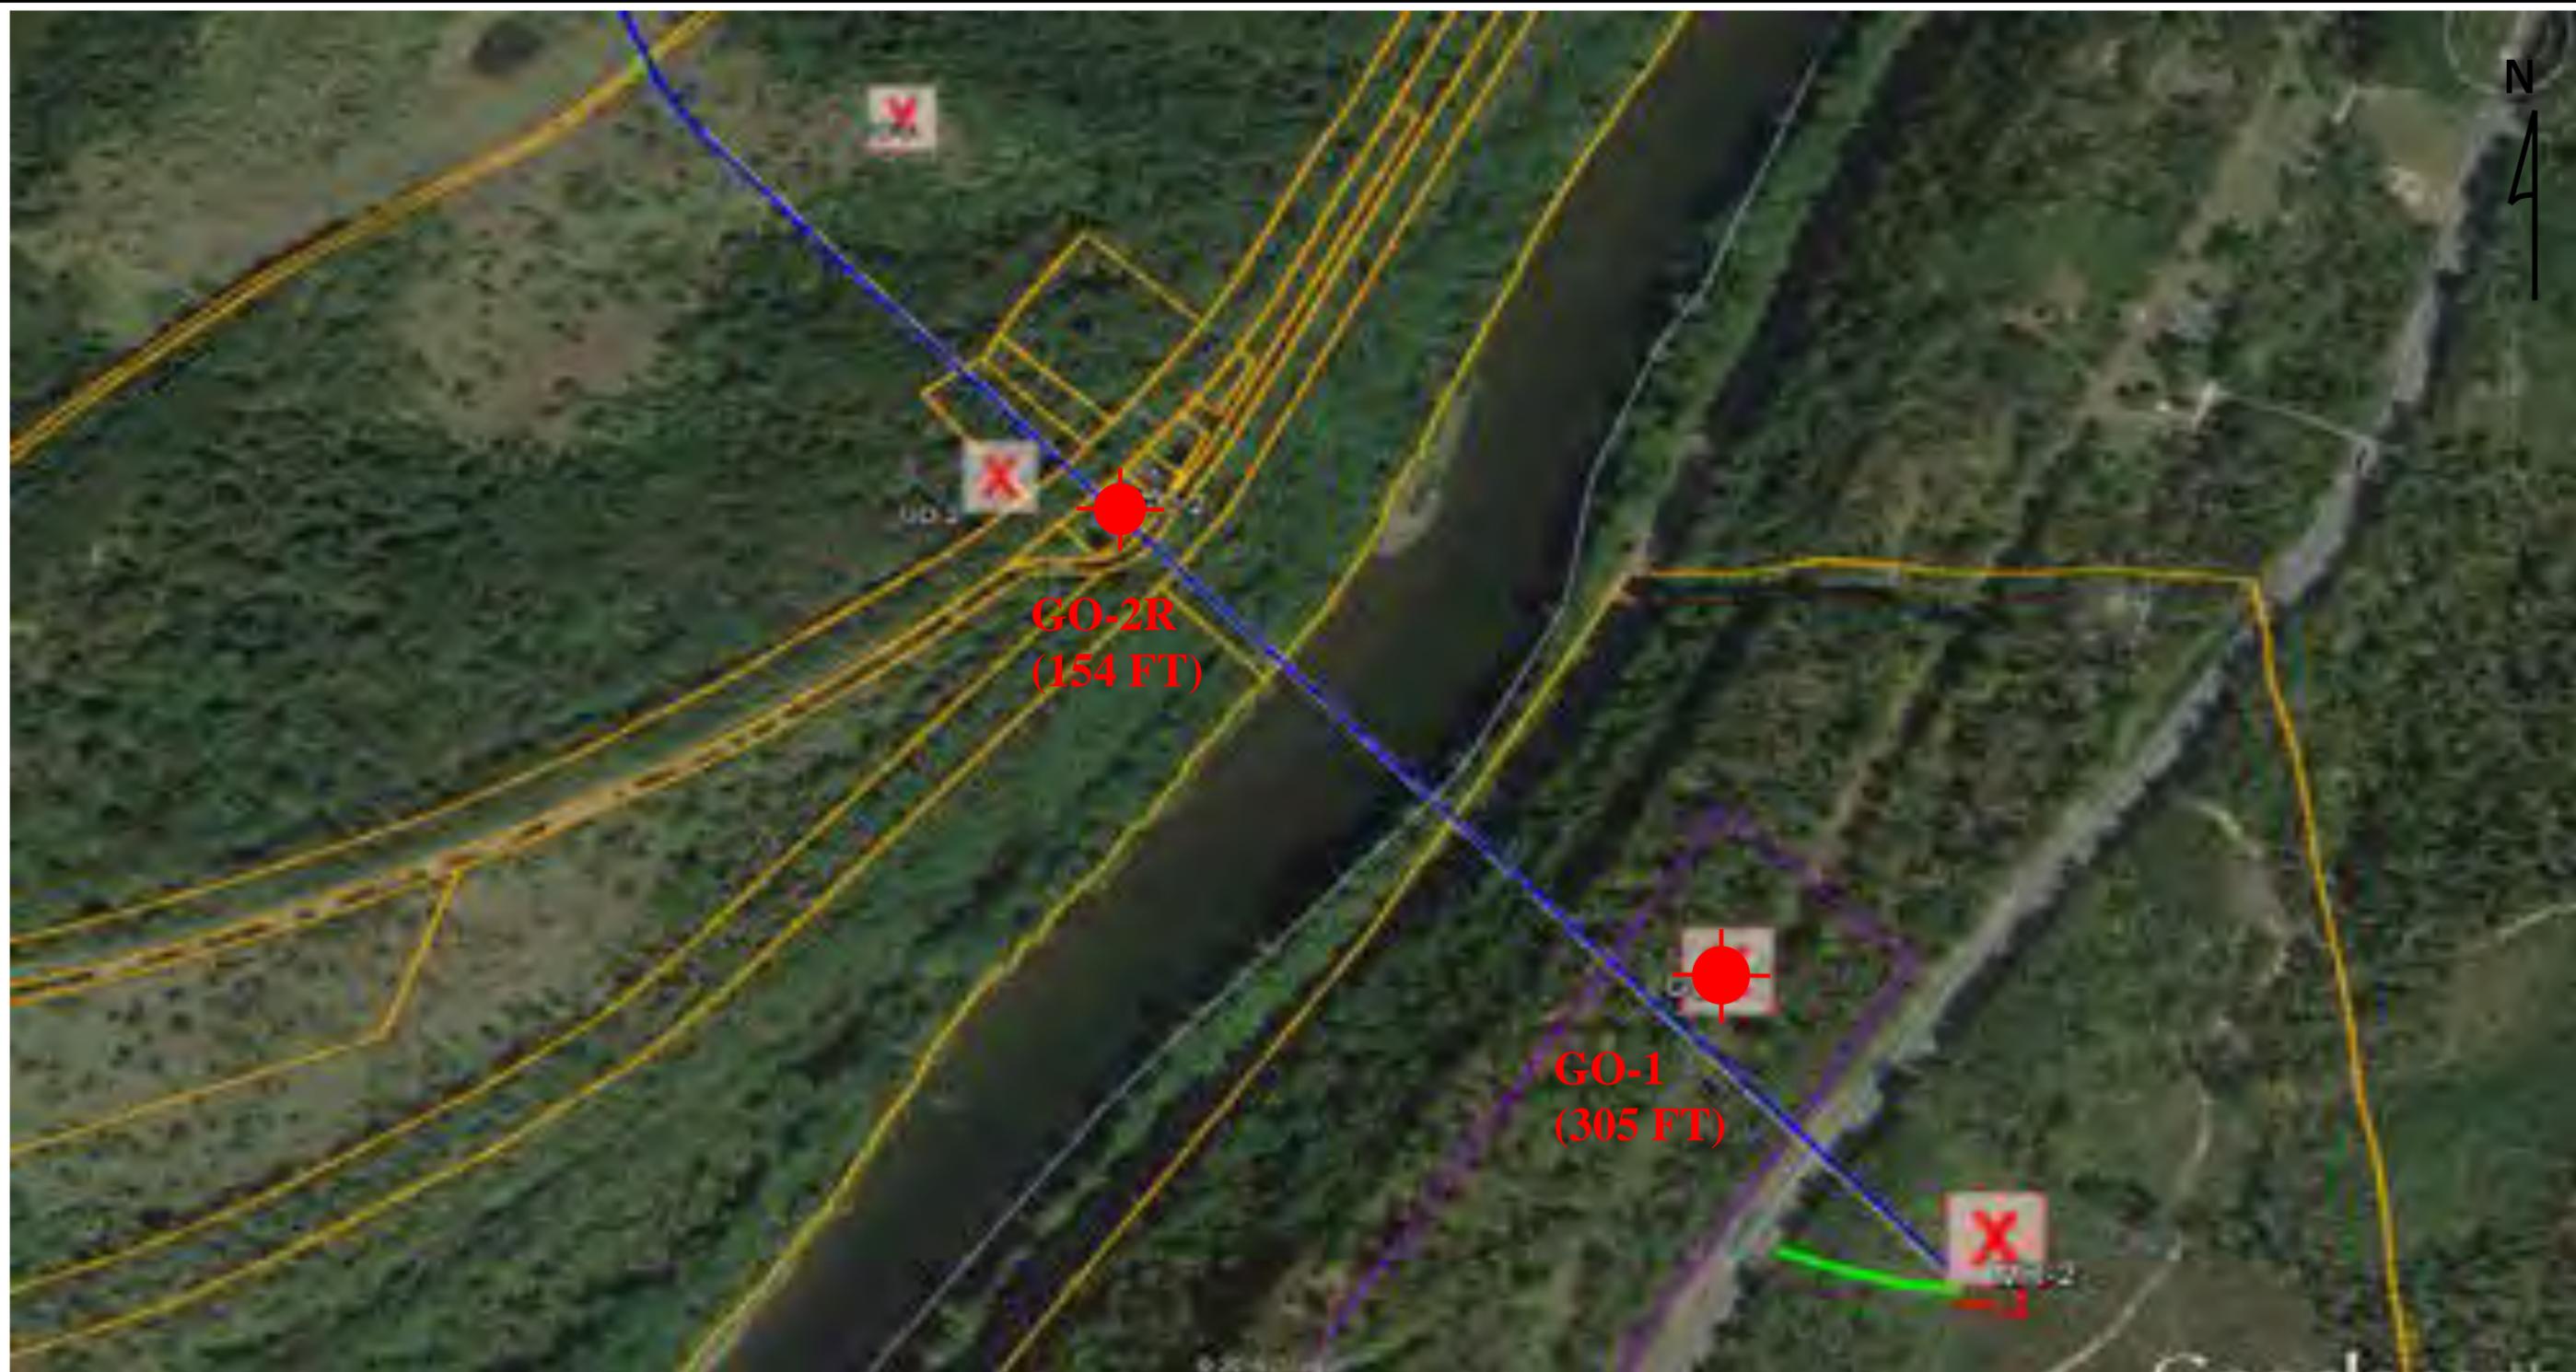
A Site Vicinity Map and Figure 1B – Boring Location Plan
